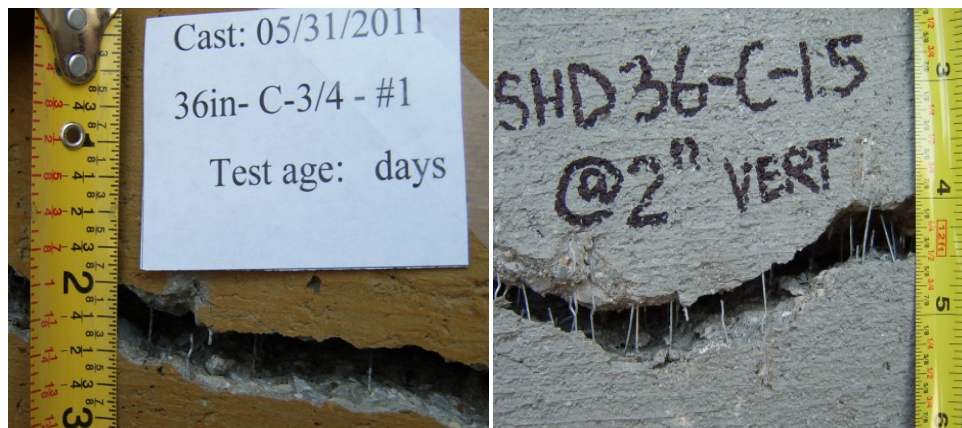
Typical crack opening for 36 in. (900 mm) SFRCP at 5% deformation
